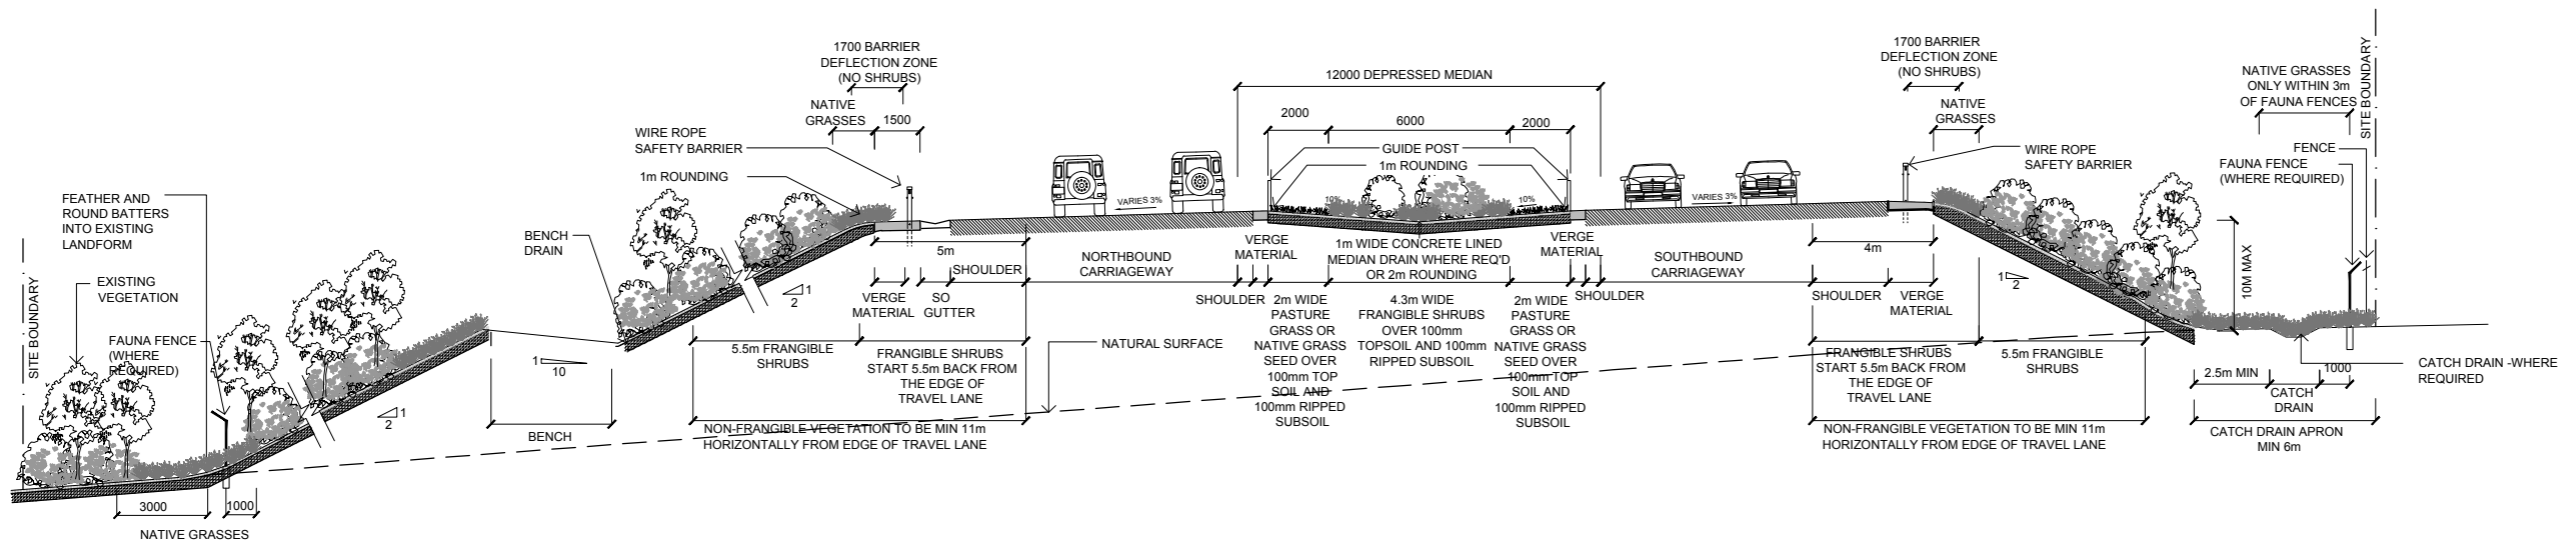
Typical Cross Section 7: Typical high embankment > 2.5m high - on superelevation
